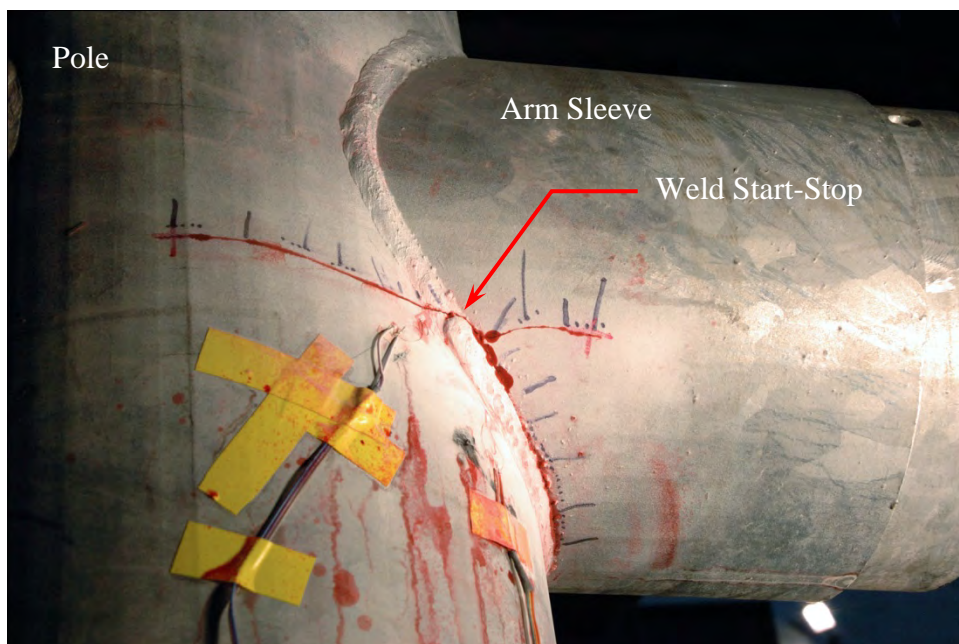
Fatigue cracking in specimen VI-2 from a weld start-stop
